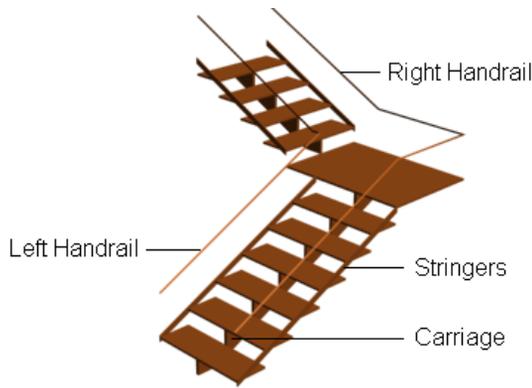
The L-Type stairs with handrails, carriage, and stringers
